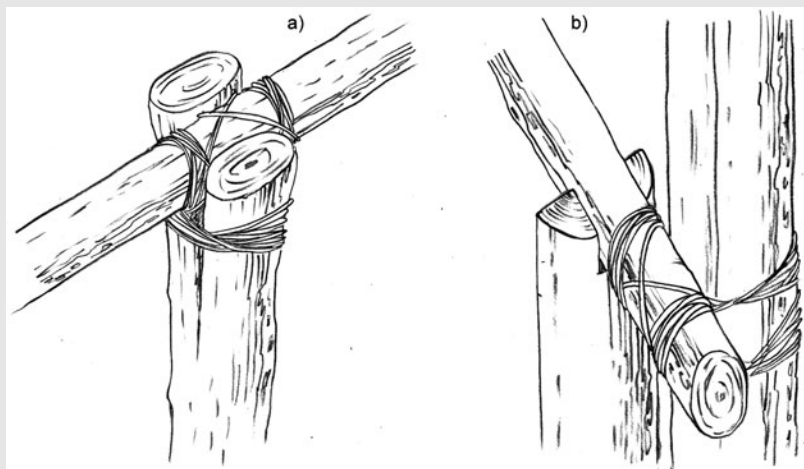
The twin-pile building technique: a) long piles supporting the roof, and b) short piles supporting the elevated floor. (Drawings: Olenka Dmytryk)
